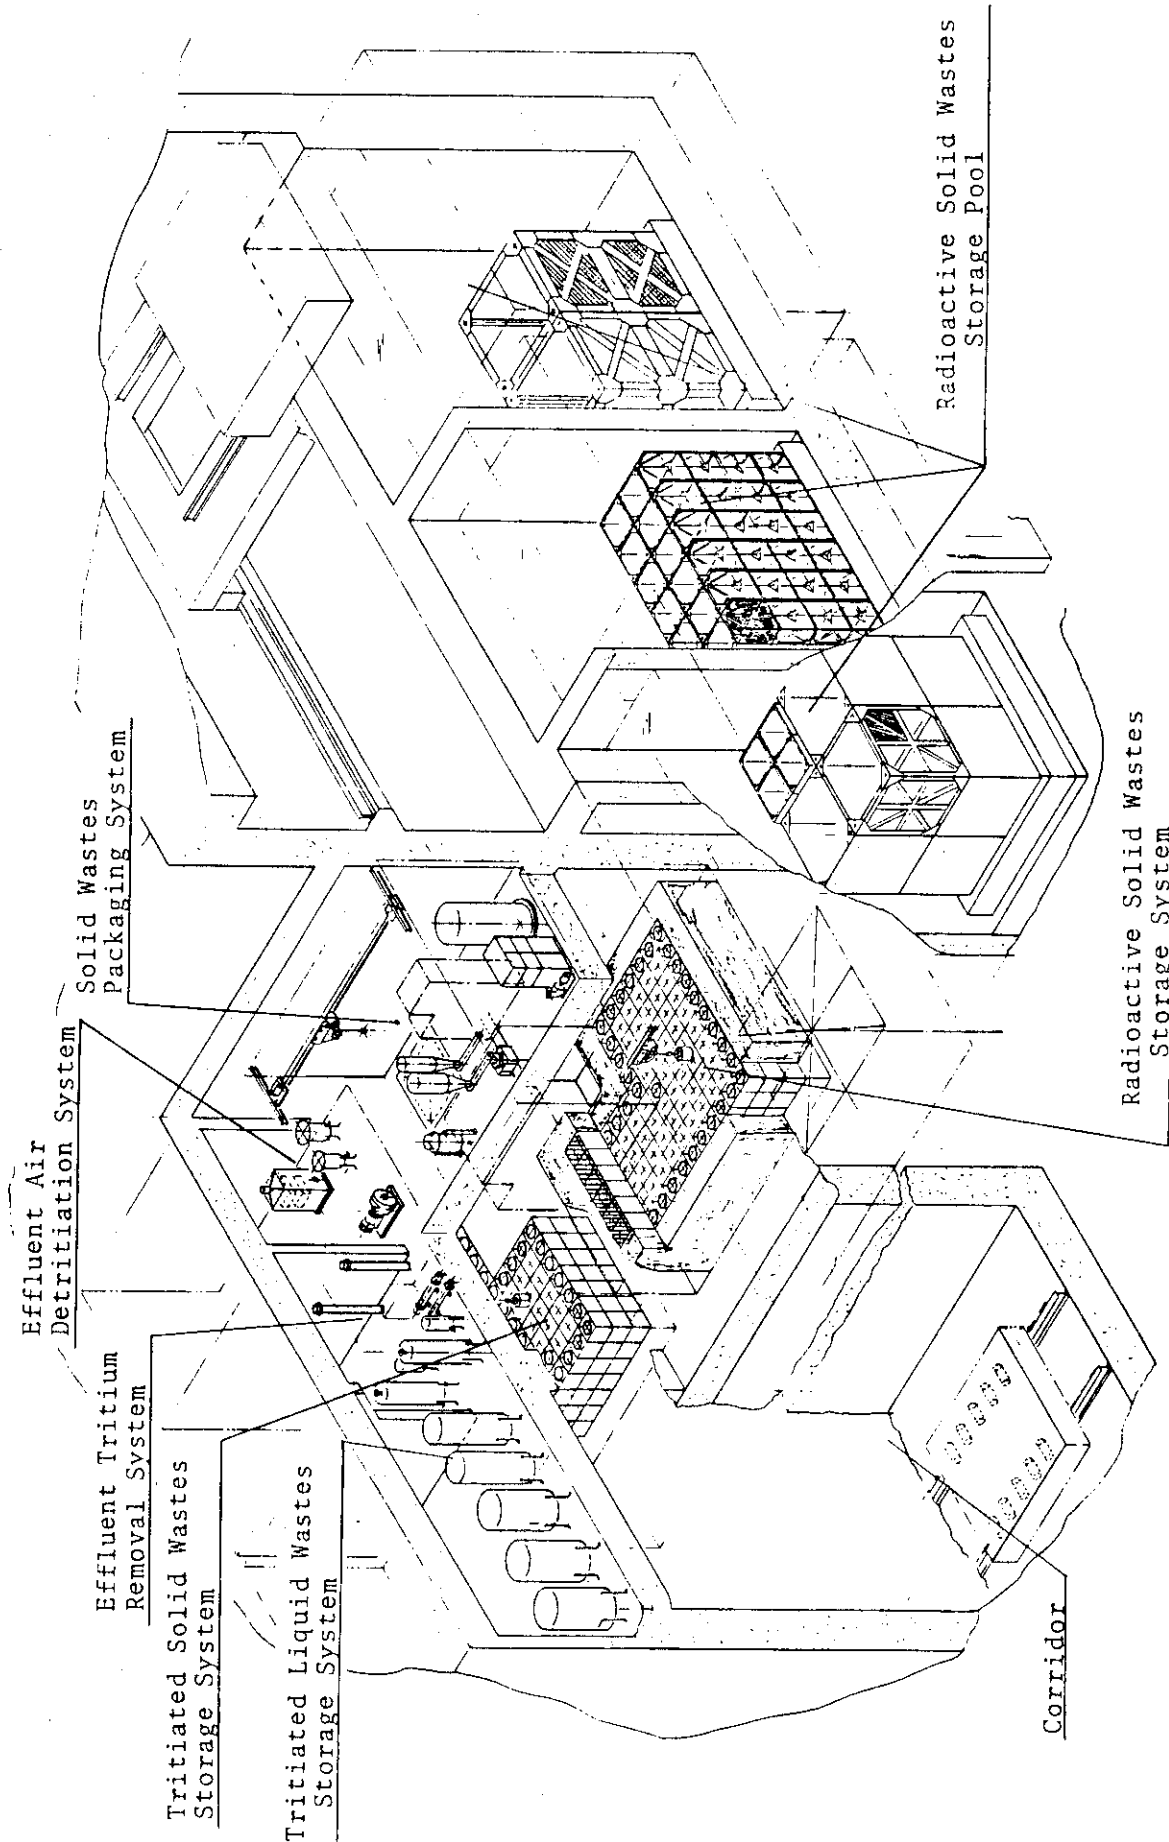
Rad-wastes treatment & storage building configuration
